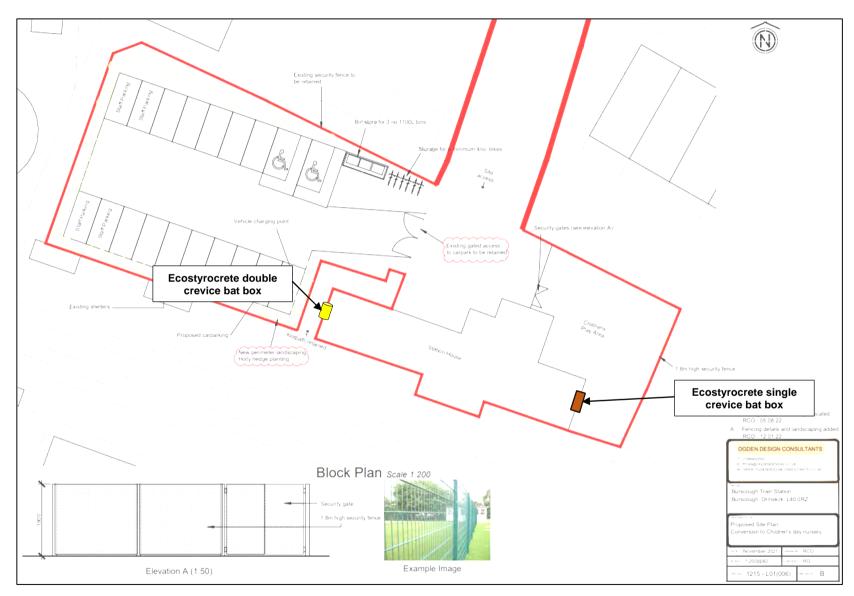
Location of bat enhancement measures over proposed site plan (adapted ©Ogden Design Consultants)
